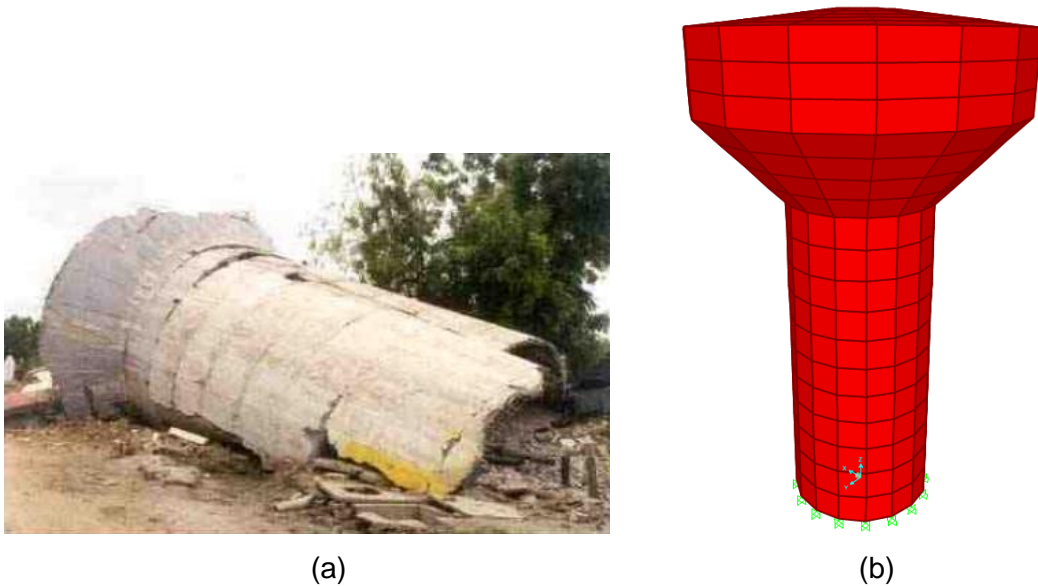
(a) Collapsed 265 kL water tank in Chobari village about 20 km from the epicentre (b) FE model of the collapsed elevated water tank in Chobari village
